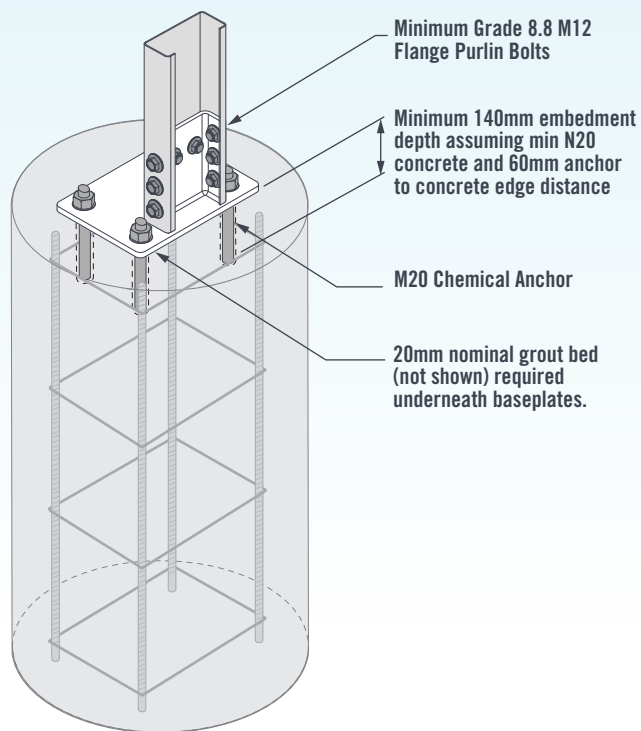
END COLUMN WITHOUT SLAB
